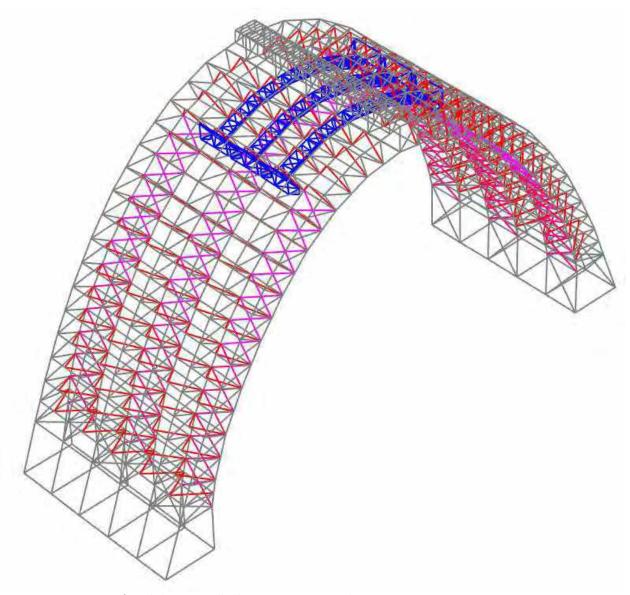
3D Isometric of Exoskeletons Installed between Existing Wood Trusses
